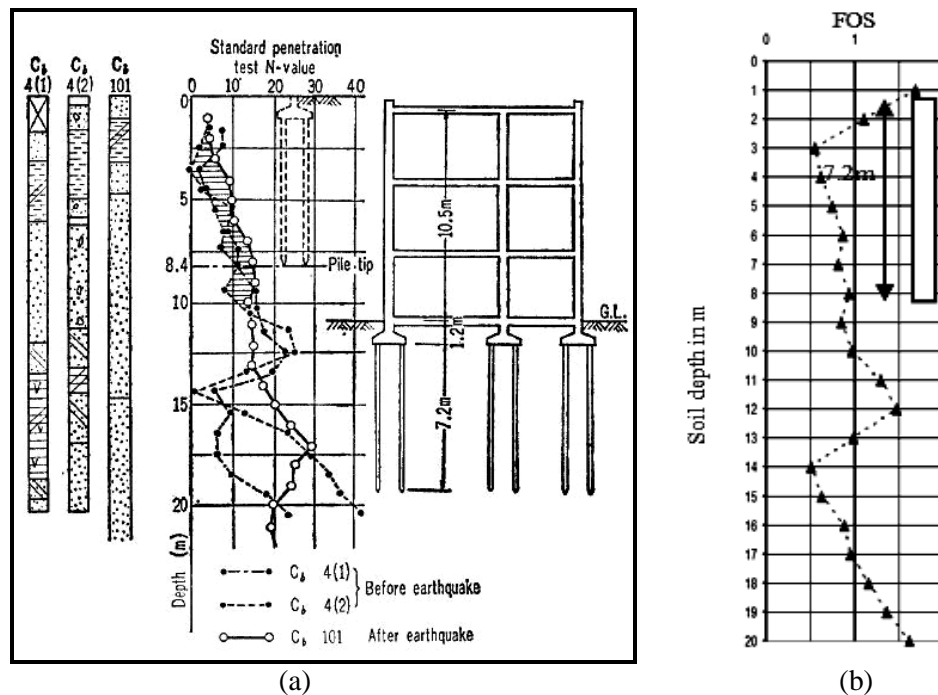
(a) Schematic diagram of Saiseikai hospital building along with soil profile;
